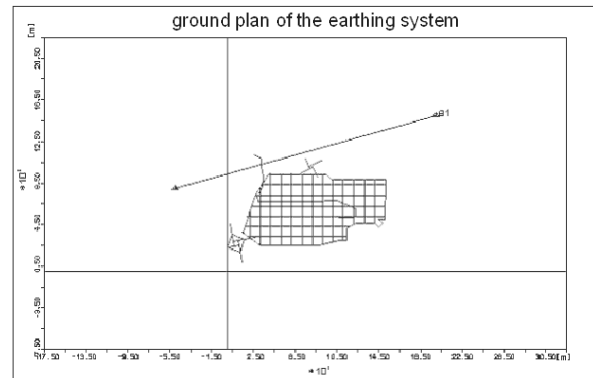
Ground plan of a substation, 110-kV and 220-kV-towers connected to the earthing system, earthing strip of 25-kV cable connected, two-layer ground.
